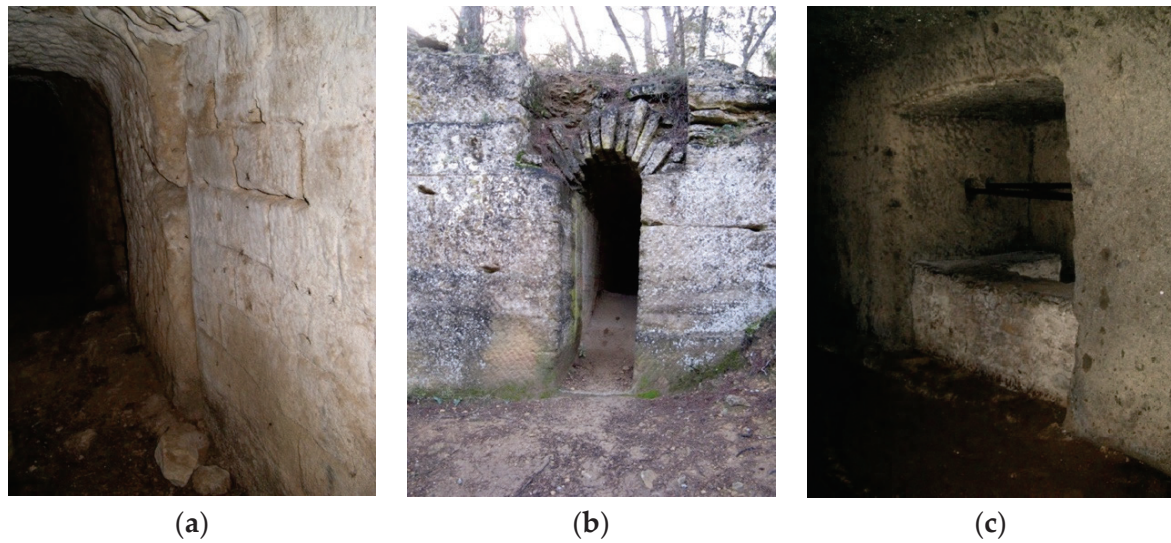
Constructions improving the shape of aqueduct tunnels: (a) masonry wall section in a tunnel where the sidewall was broken out. Traconnade aqueduct of Aix-en-Provence (France). (b) A vault structure over a tunnel that was dug from the top and then closed with a vault. Traconnade aqueduct, quarry of Santa Anna, Peyrolles. This tunnel is visible in profile, since it was later cut by a quarry. (c) Bullica tunnel, a maintenance tunnel of the Marcia aqueduct, with access shafts to the narrow aqueduct tunnel that runs at a deeper level. The metal bars are modern, but in ancient times a wooden beam would have been placed above the shaft to allow workers to descend and clean (Photos Cees Passchier).
